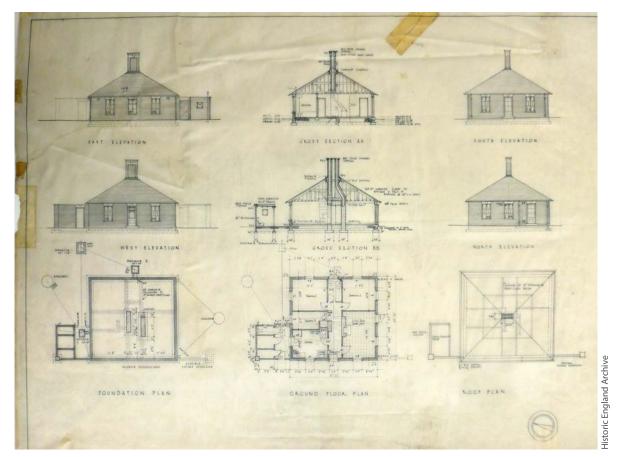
LCC plan and elevations for proposed 'superintendent's lodge' at the north-east entrance, 1956
